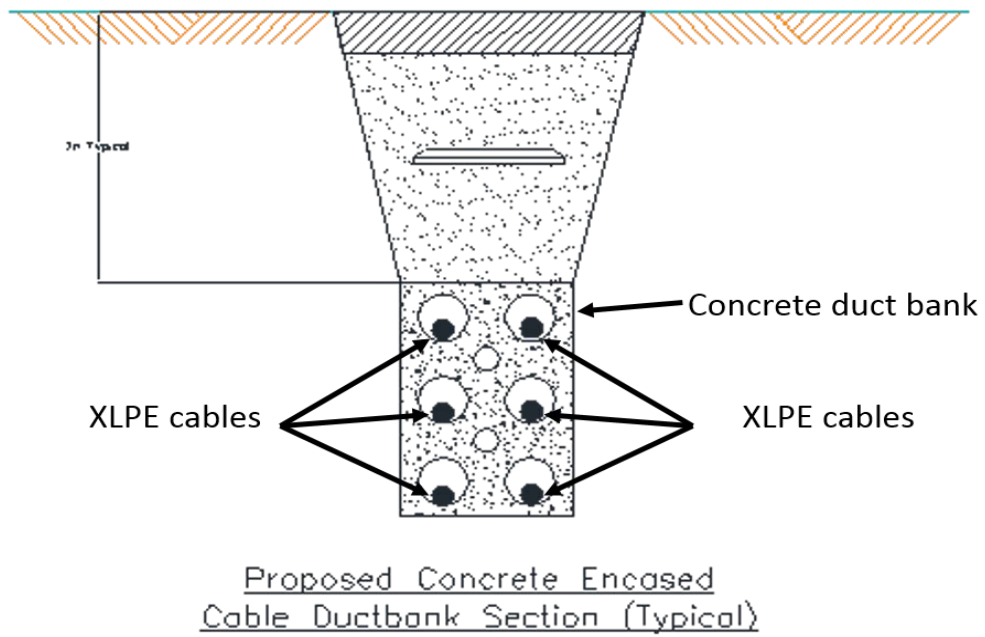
Schematic Layout of the Proposed Cable Configuration
